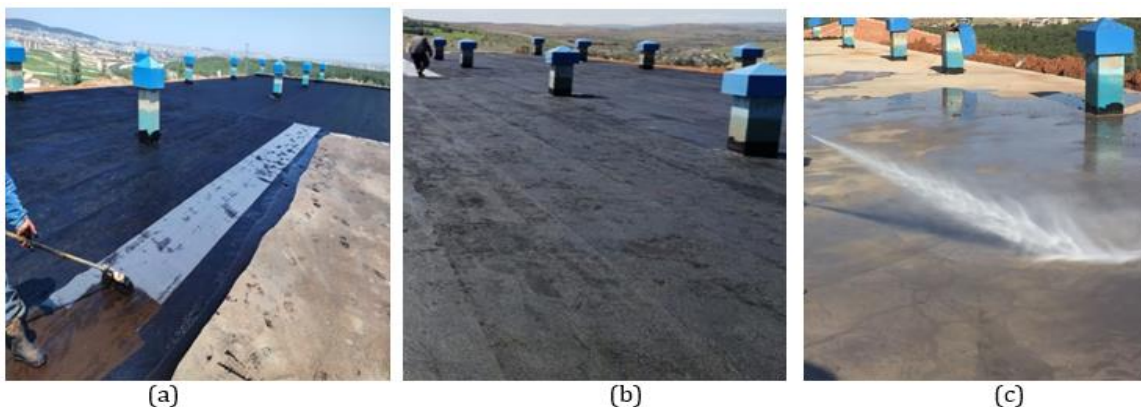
(a) First Layer Waterproofing On The Roof Surface, (b) Second Layer Waterproofing On The Roof Surface, (c) Waterproofing Screed
